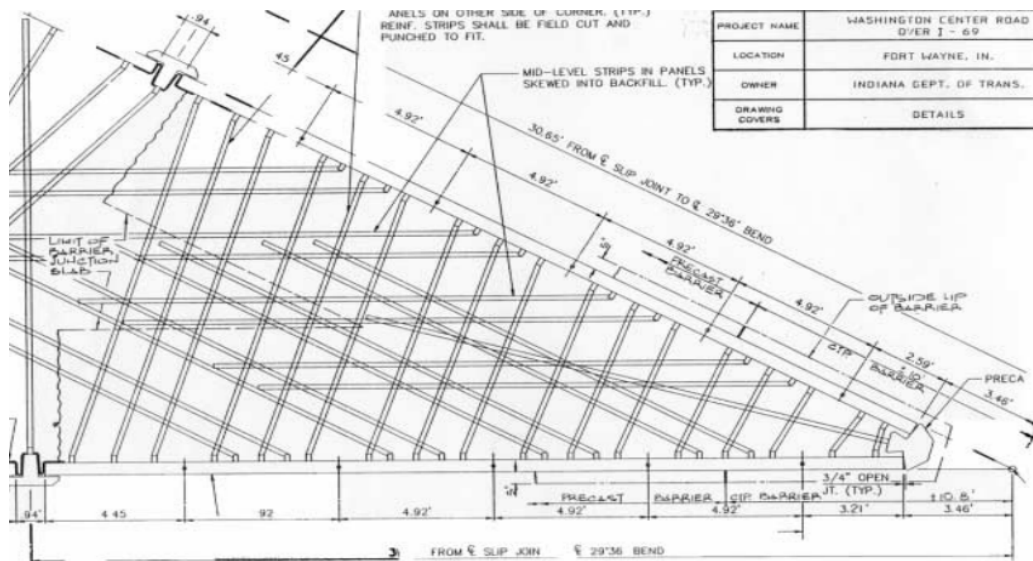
Overlapping of earth reinforcement of an MSE wall
